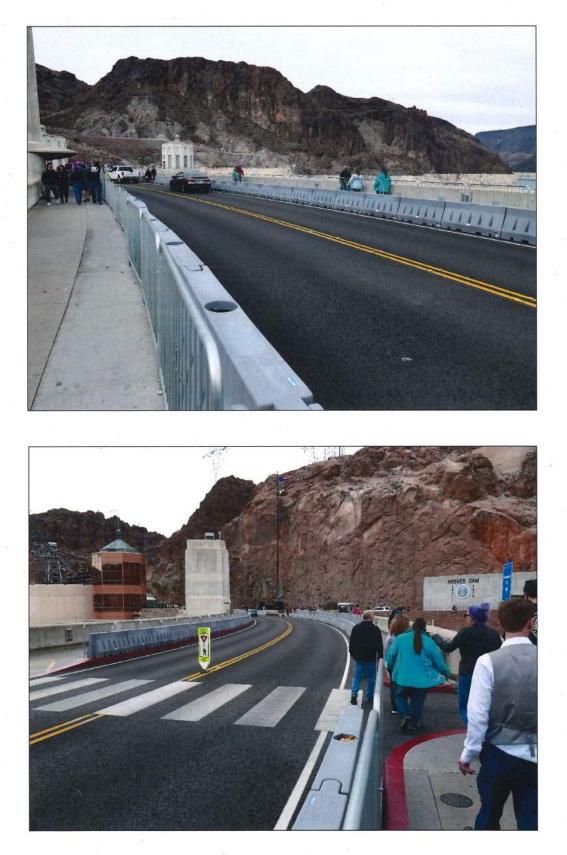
Currently installed Jersey barriers, fencing, and crosswalk at Hoover Dam.
